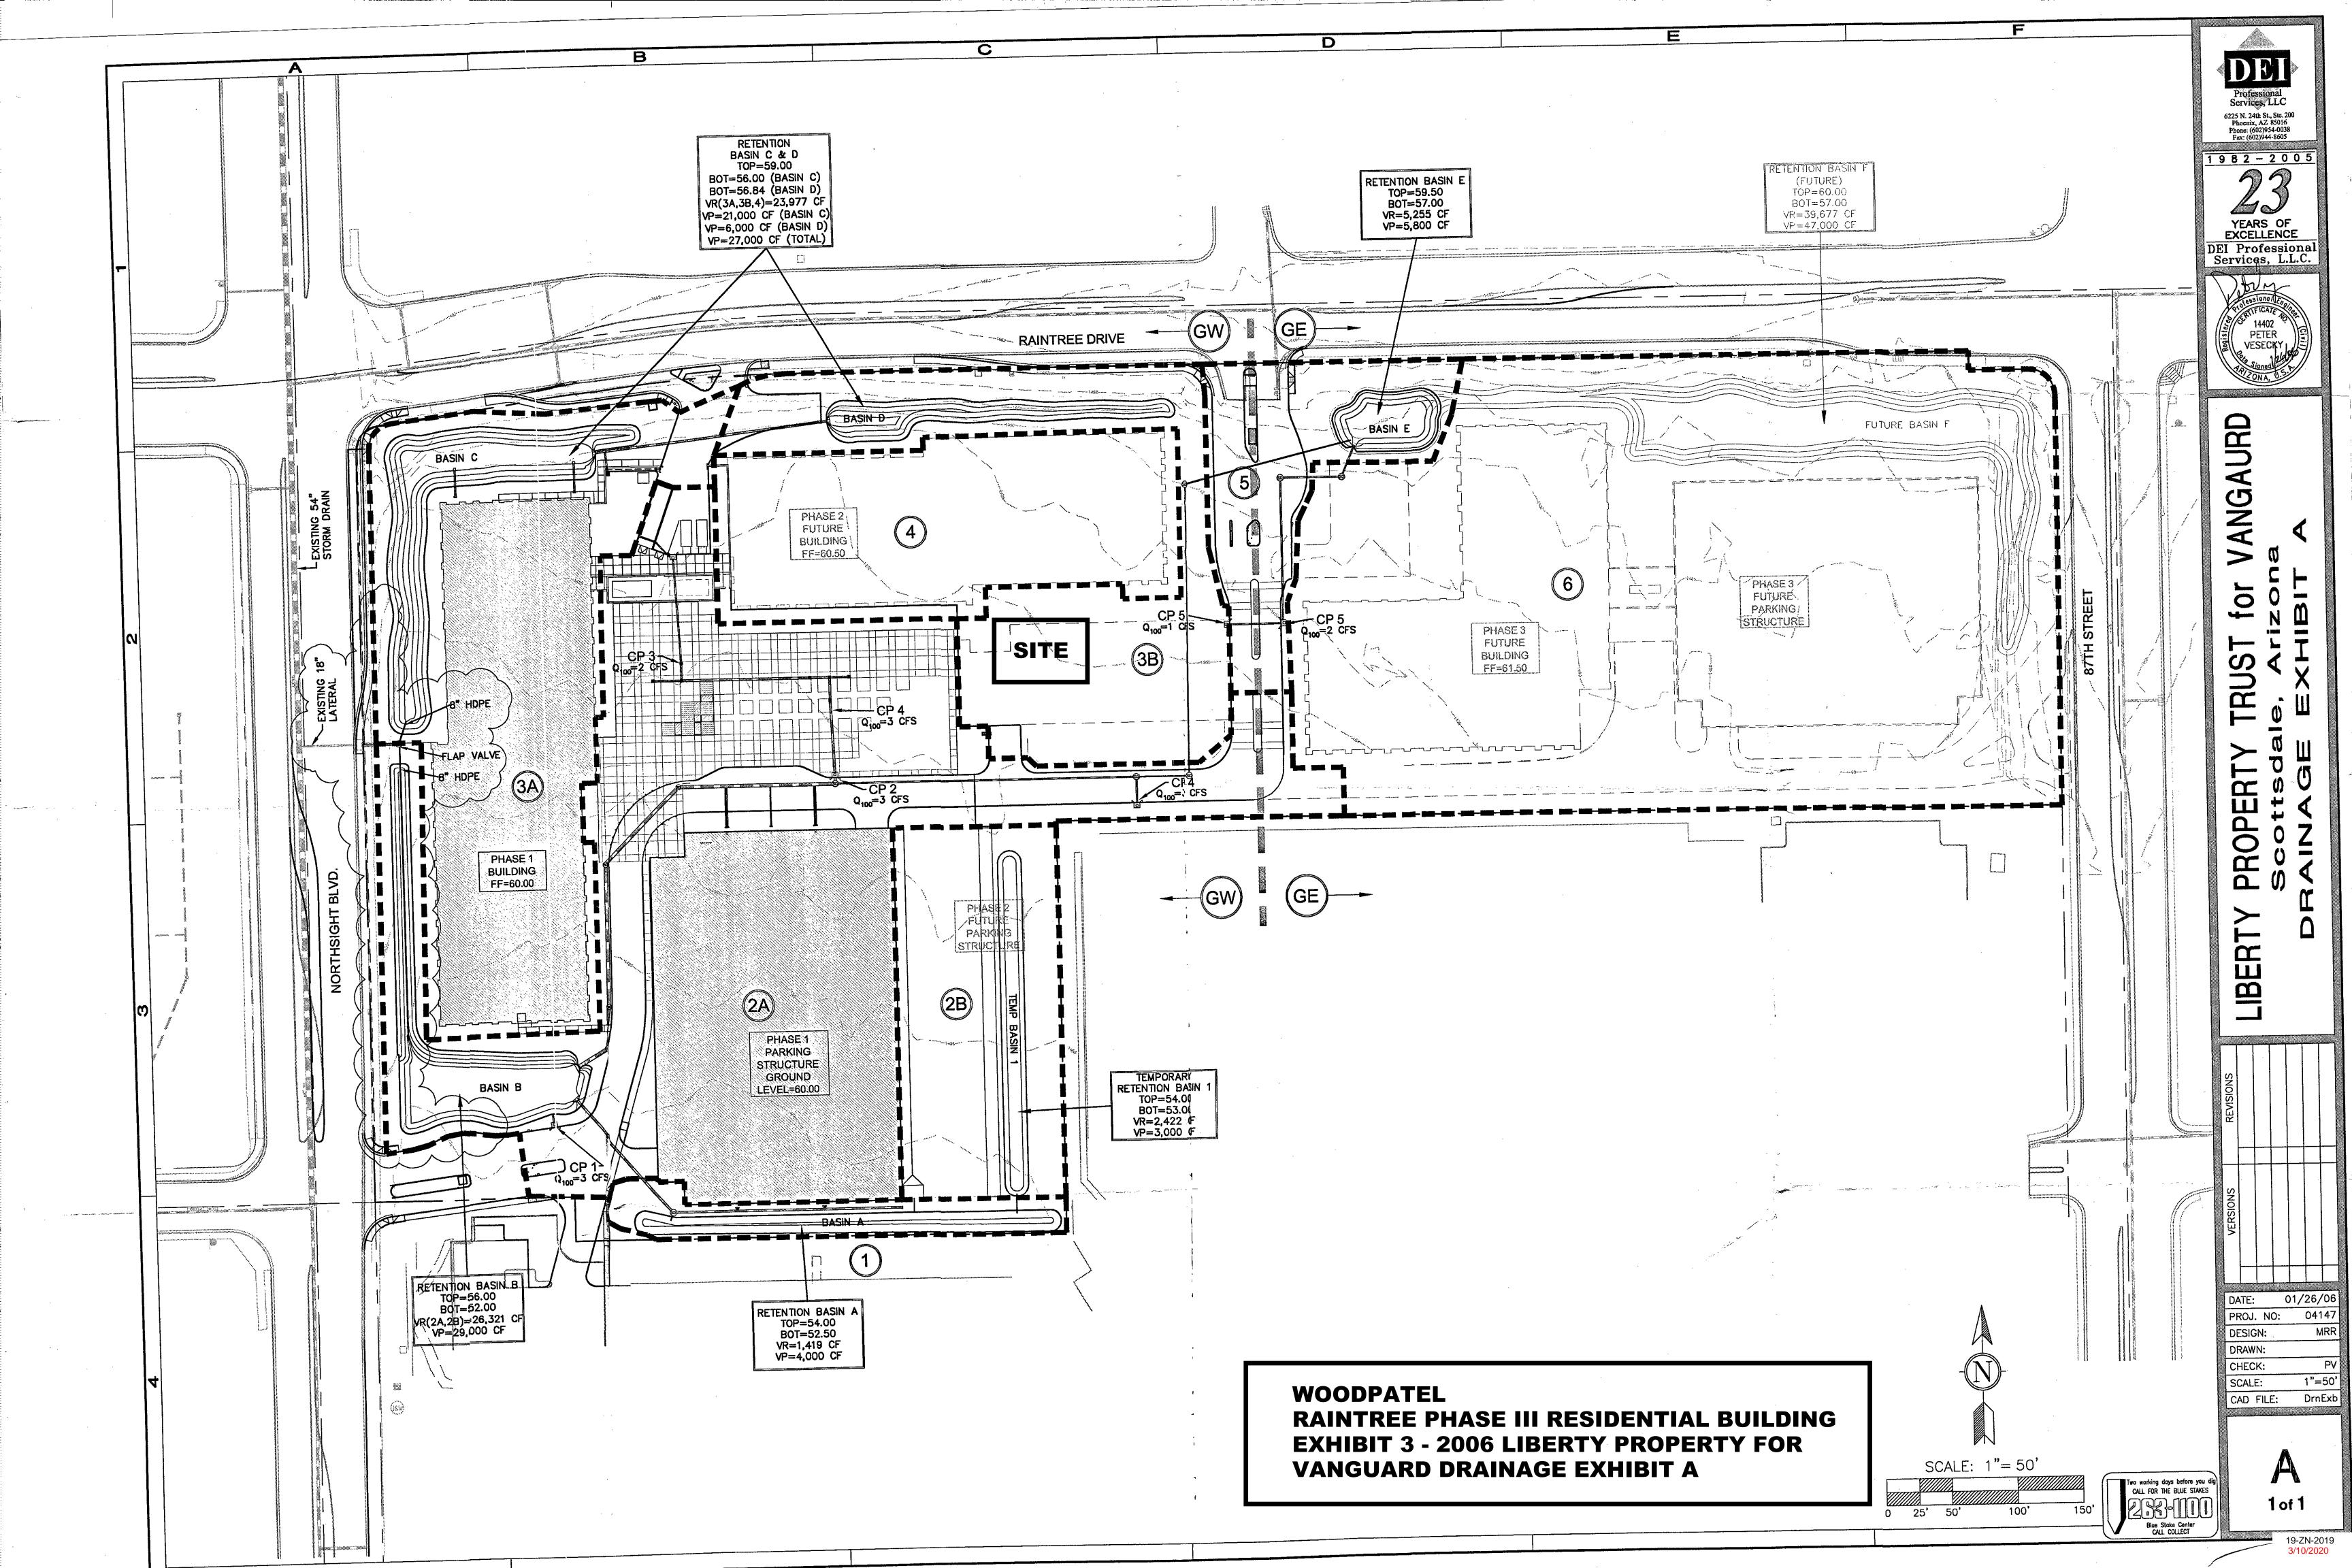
EXISTING DRAINAGE EXHIBIT
